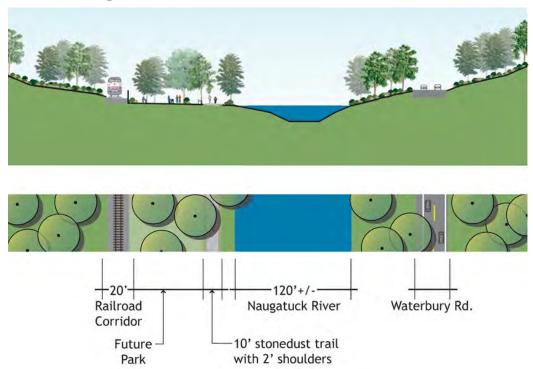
Trail cross-section south of Frost Bridge Road (Route 262) and potential new park space along the west bank of the Naugatuck River.
